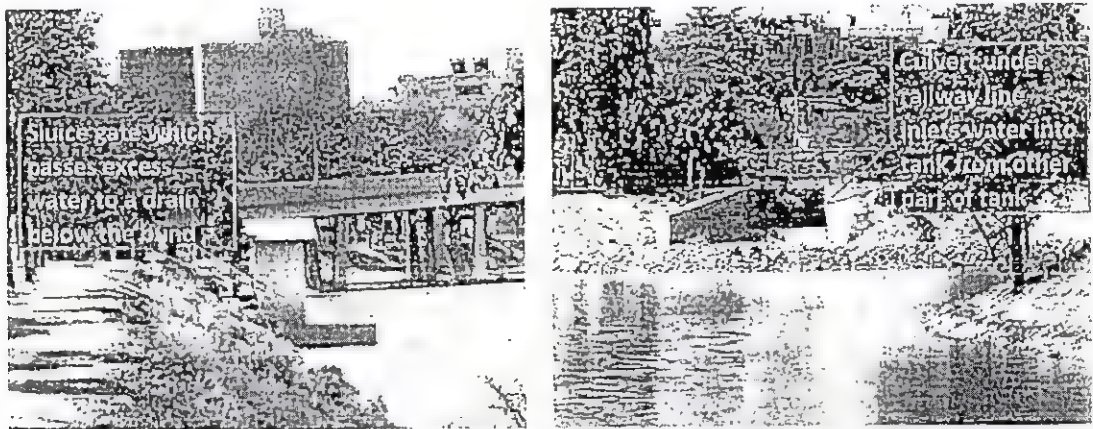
(a) & 8(b) – Sluice and Inlet of Benniganahalli tank near K.R.Puram. There is no waste weir. It is divided into tanks by passing of a railway line. The other part of the tank is non accessible as it is surrounded by 3 railway lines in triangular pattern. Surplus water from that part of tank can pass off through the culvert under railway line.
